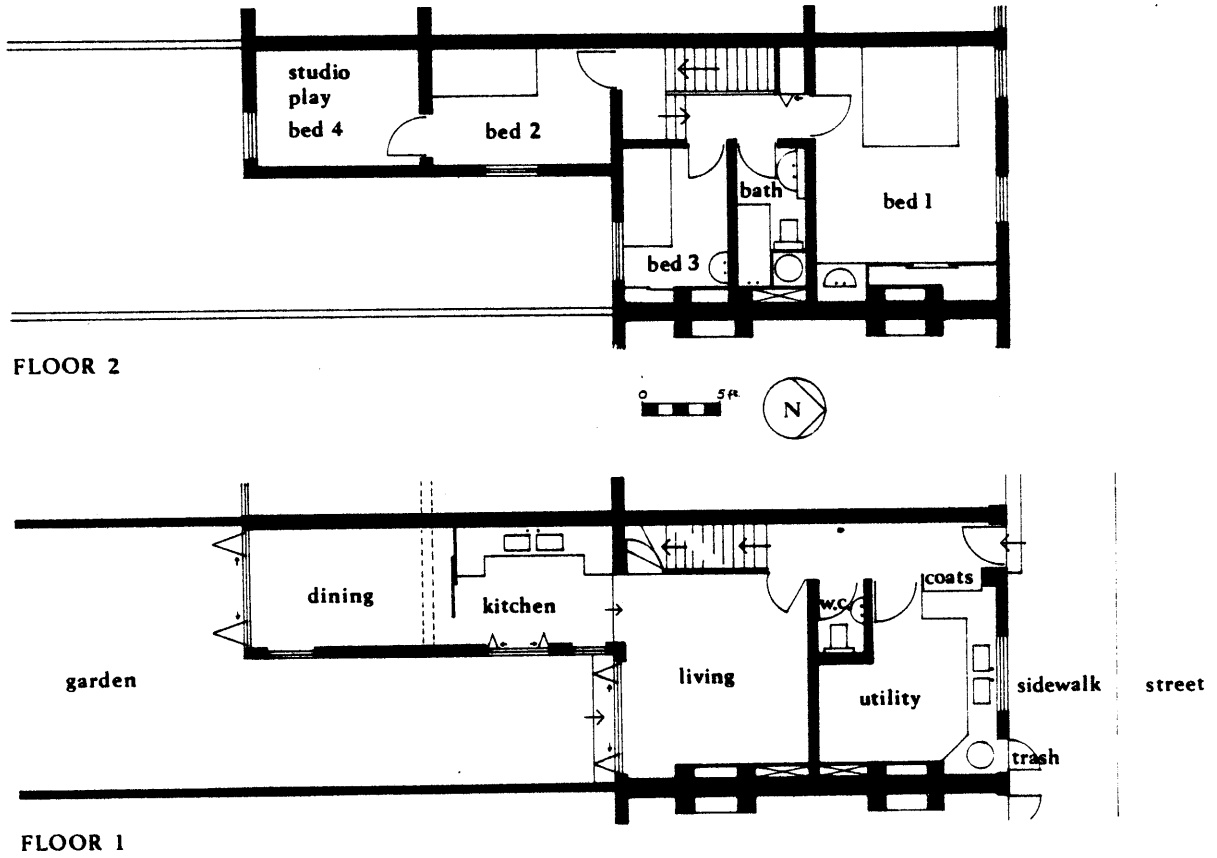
Plans showing suggested improvements to existing row houses. Non-solar design; control test case.
